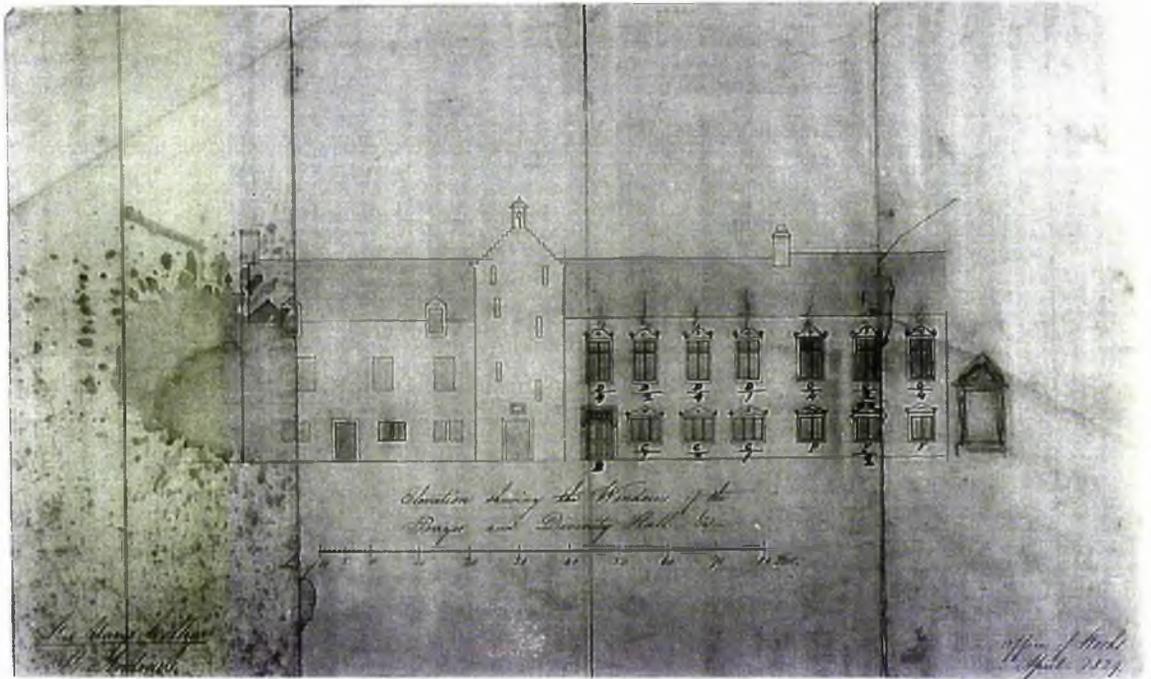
St.Mary's College. Proposed alterations to east elevation. R. Reid, June,1829.
